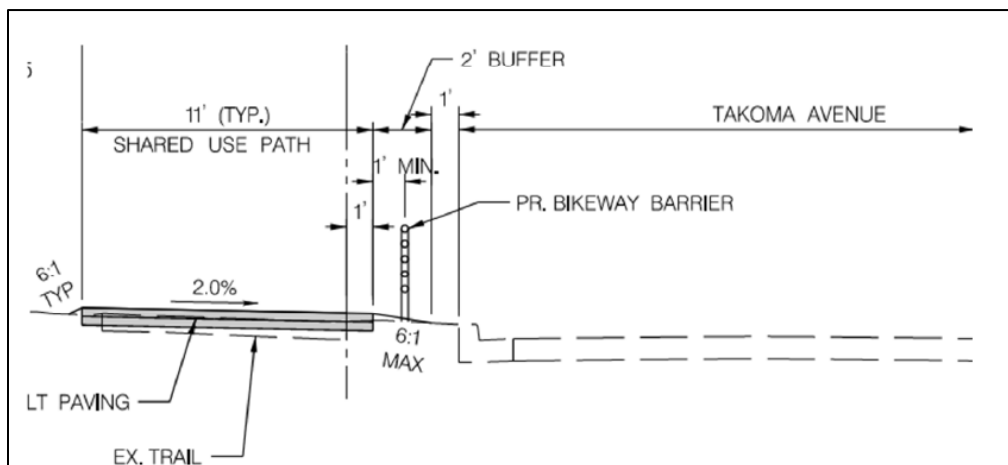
Proposed Cross Section - Station 54+50 to 58+50 Looking North
